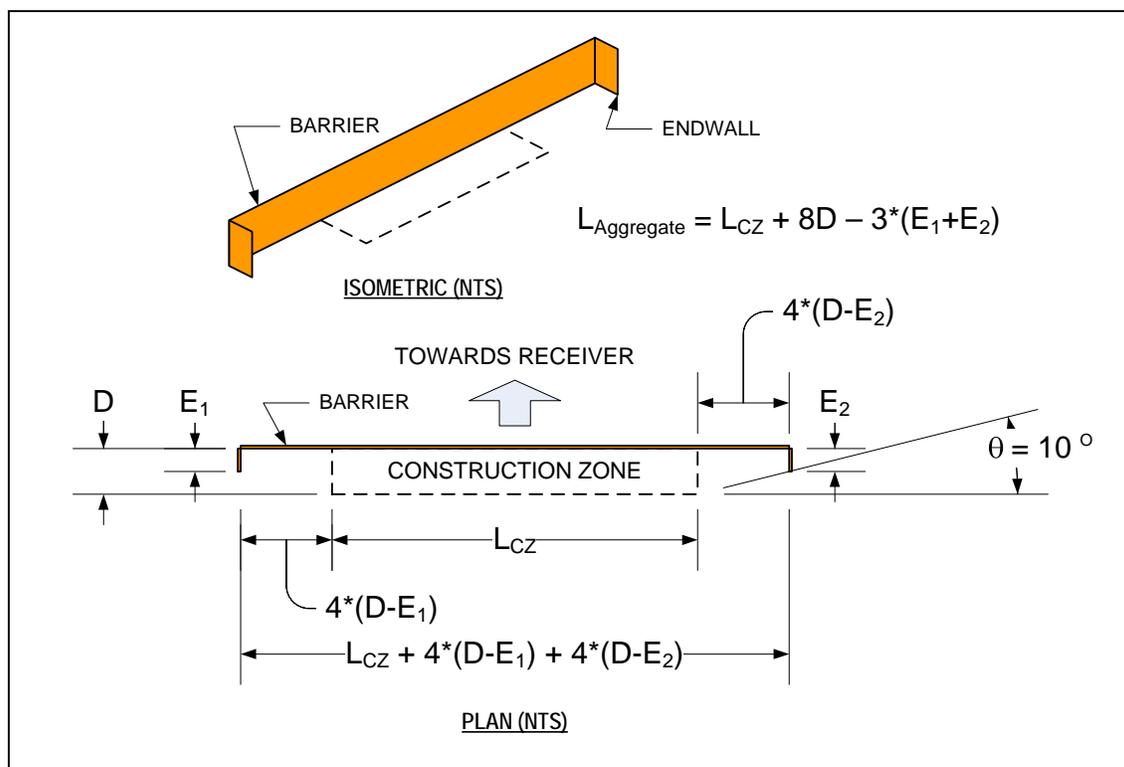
shows an alternative barrier layout requiring a shorter aggregate barrier length by adding sidewalls to the ends of the barrier. These sidewalls help preserve the low-flanking angle  $\theta$  and maintain the same construction zone footprint. For example, if the intended construction zone had a length of 500' ( $L_{CZ}$ ) and a depth of 150' ( $D$ ), the aggregate barrier length from Figure 1 would be 1,700 feet ( $L_{CZ}+8D$ ). But with endwalls as dimensioned in Figure 2, assuming dimensions  $E_1$  and  $E_2$  are the same and equal to 75', the aggregate barrier length ( $A_{\text{aggregate}}$ ) would only need to be 1,250 feet (*i.e.*, 1,100' plus the two endwalls). This difference in aggregate length can, of course, have considerable impact on the estimated installed cost of this mitigation.
